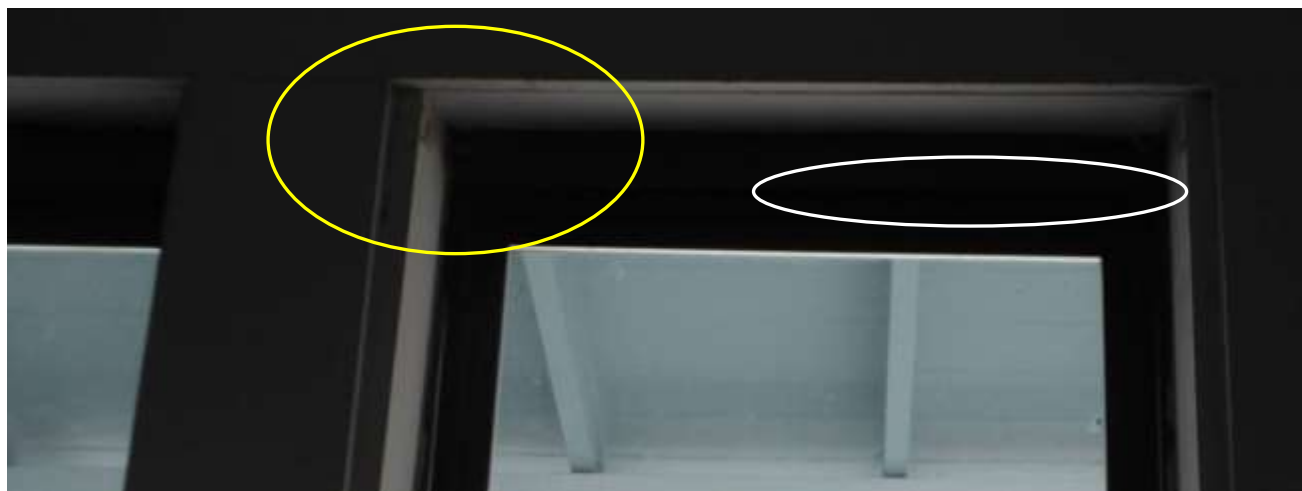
Example of water stains and gaps on windows in home where improperly installed and canted. See window section comments.
